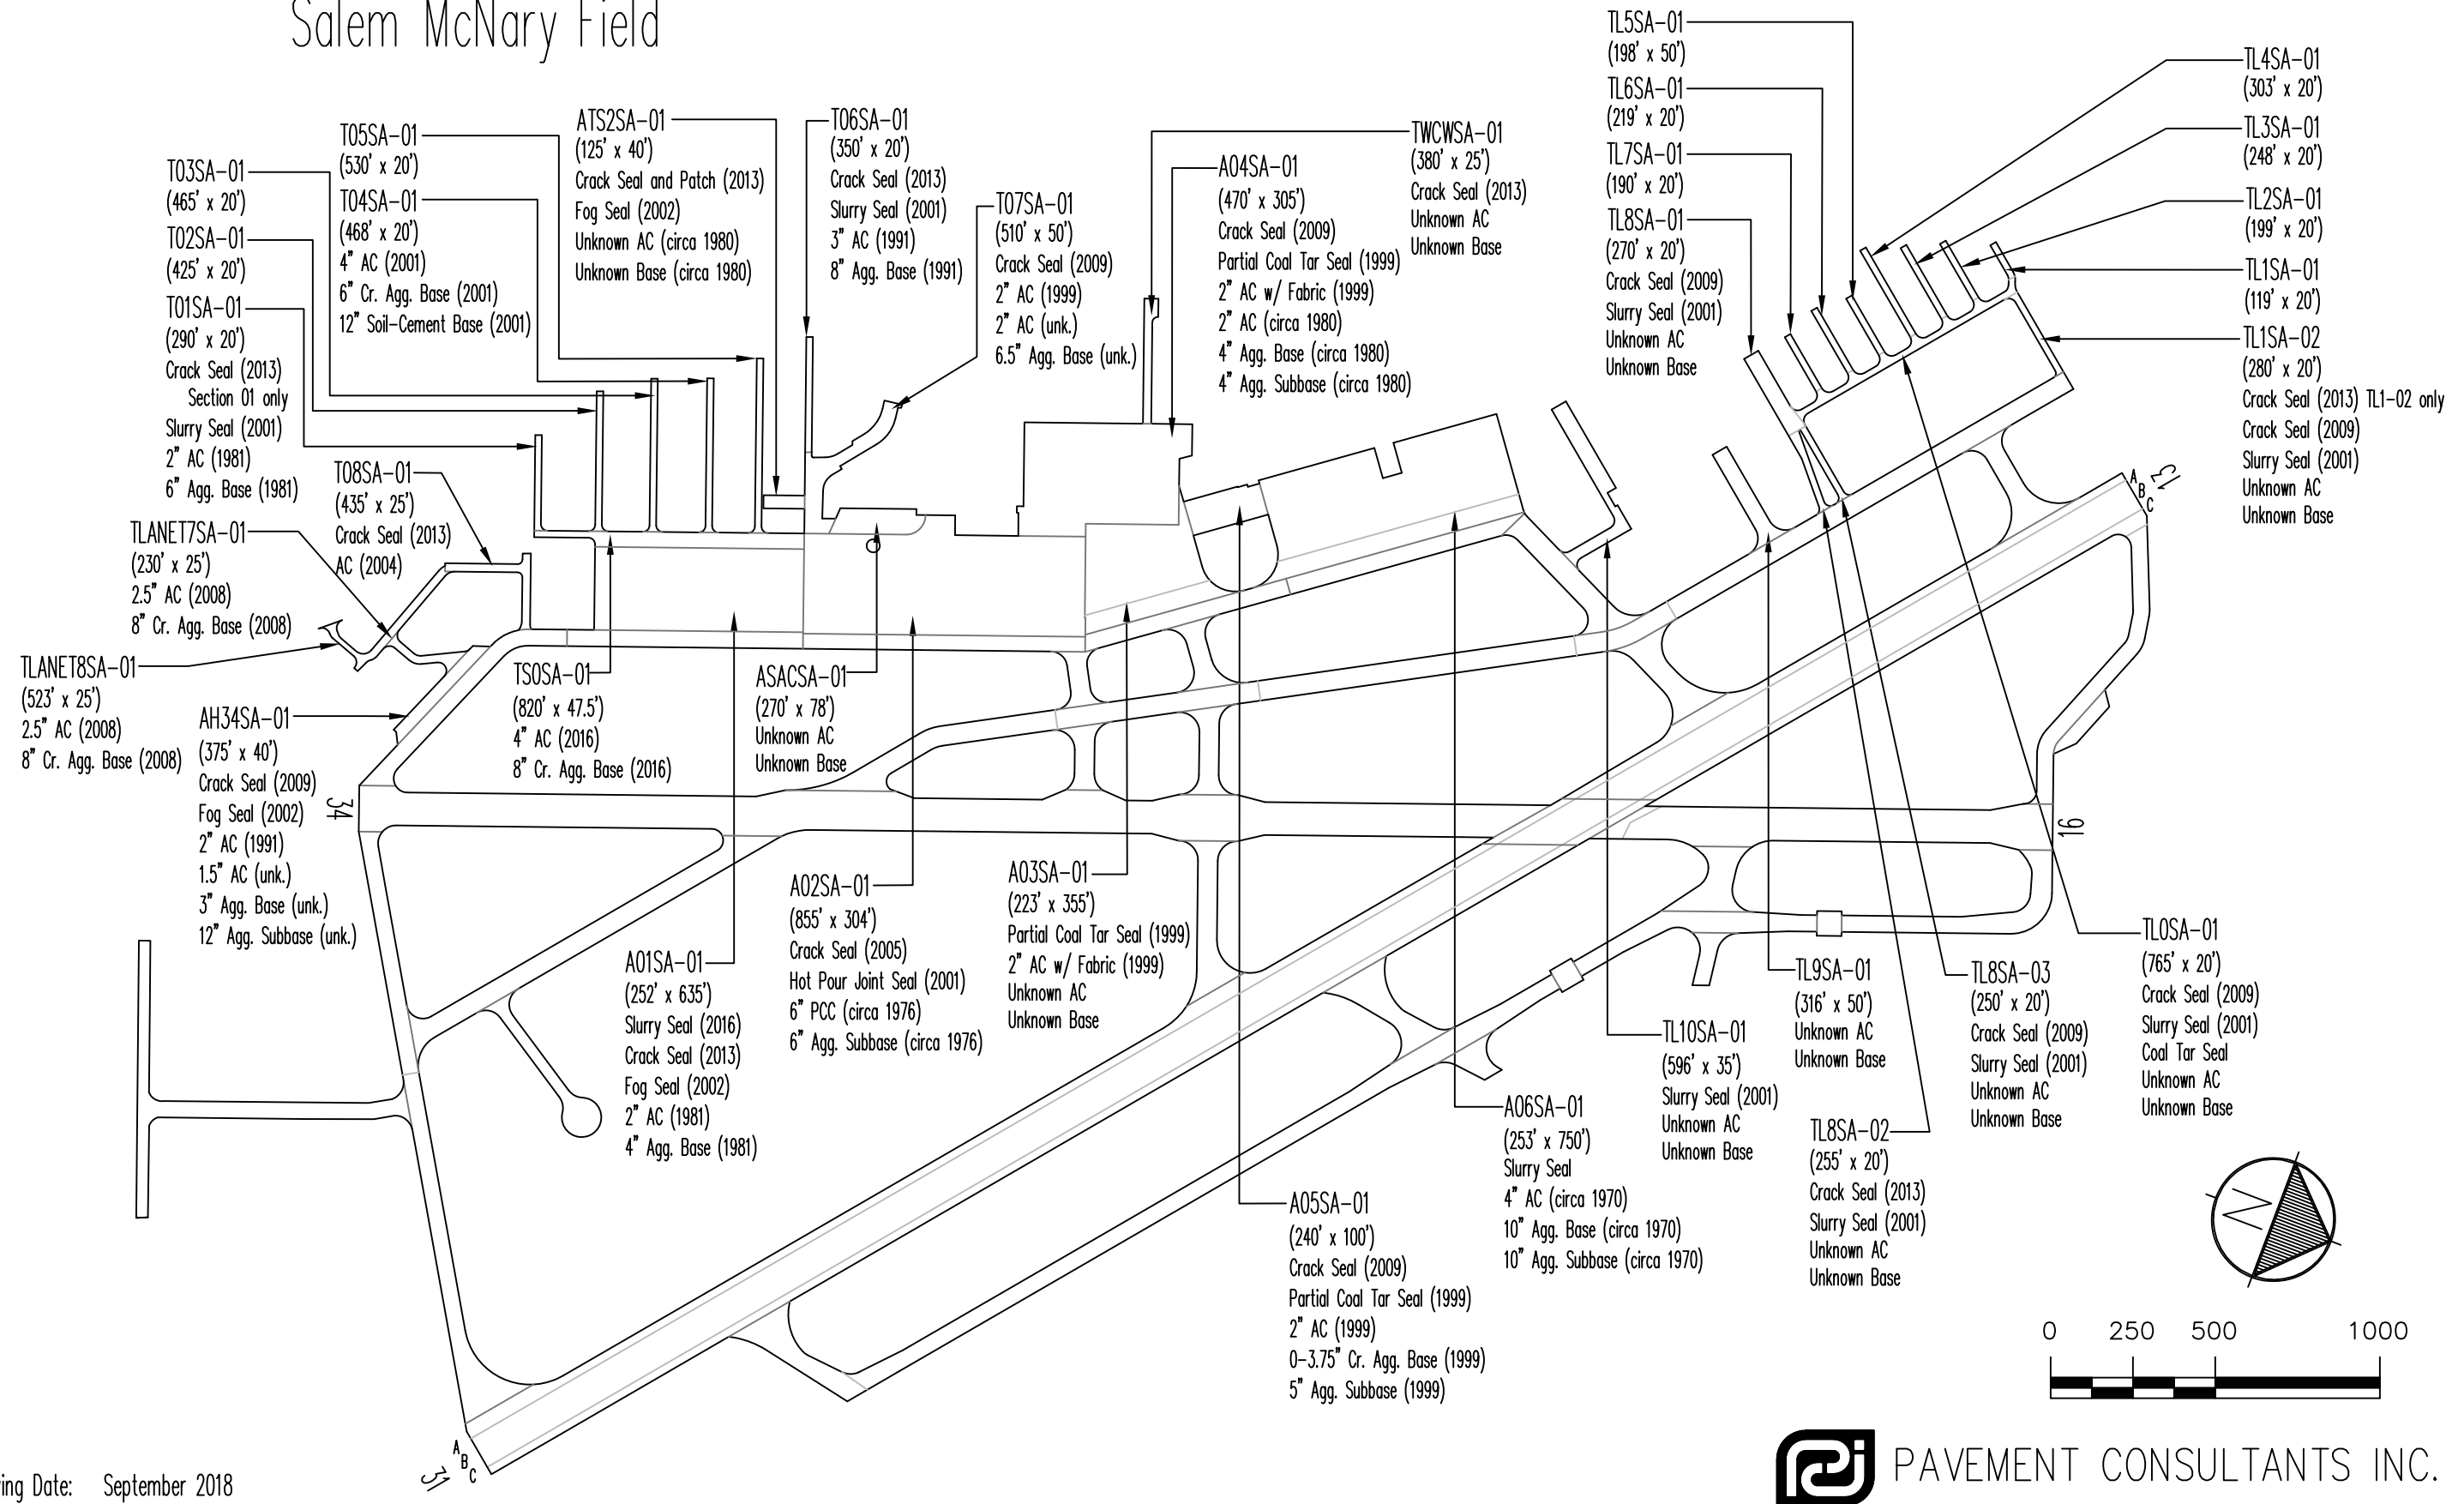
B. Airport Layout, Dimensions and Pavement Cross-Sections – Taxiways.
